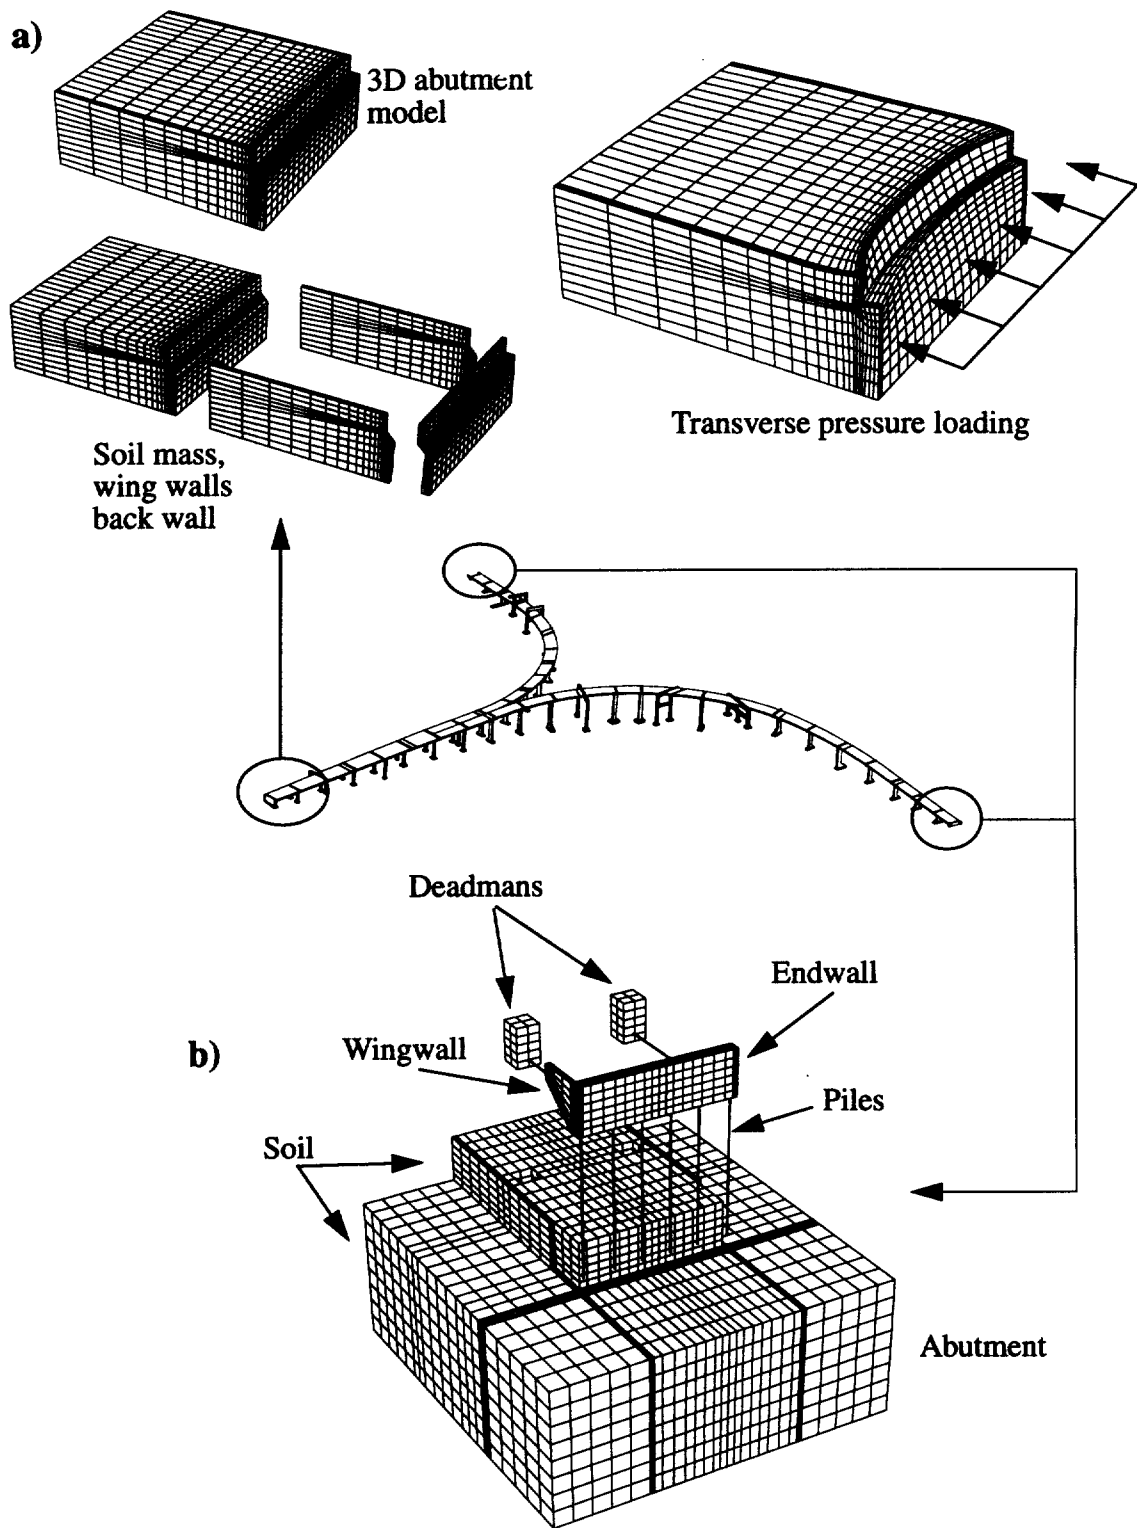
Determination of abutment and foundation stiffness from loading of substructure models. a) Abutment model (WS75), b) abutment model (ES1 and WS99).
